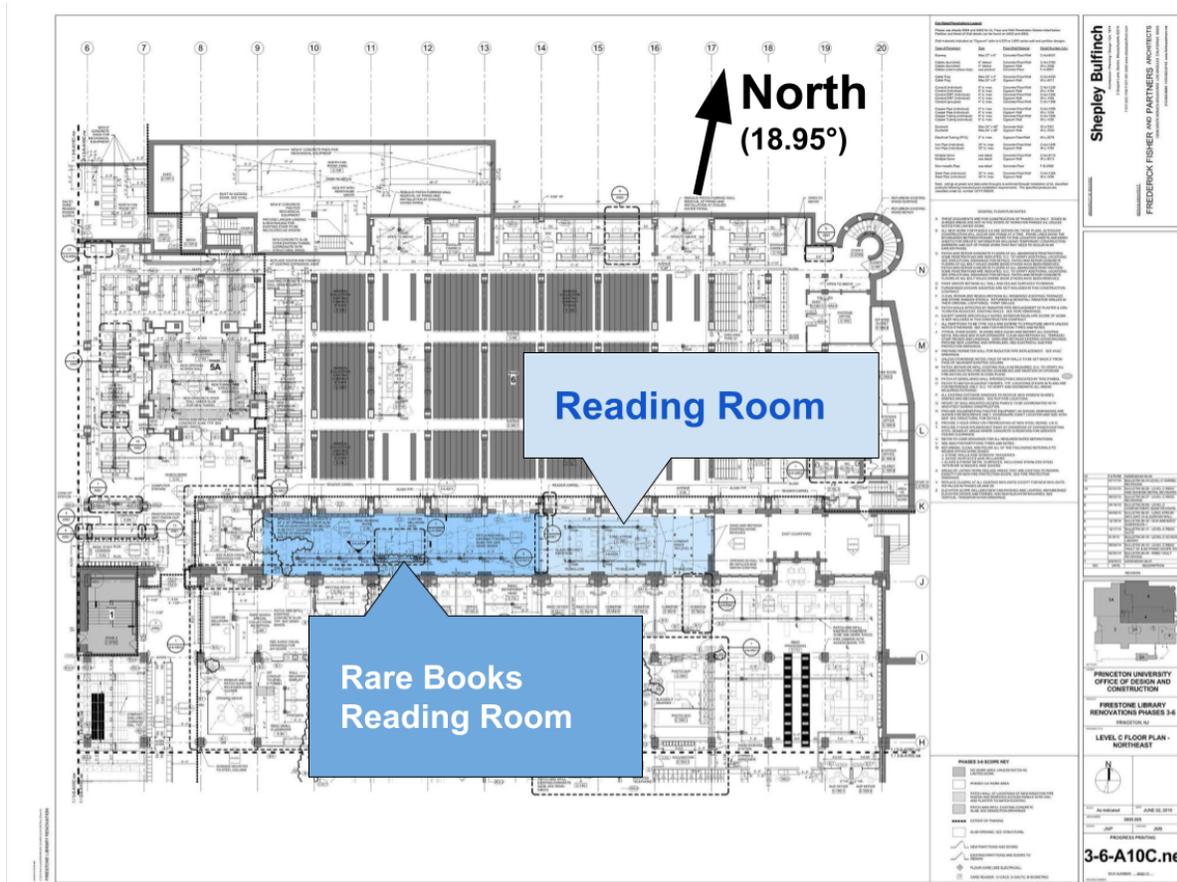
Architectural Plan of the northwest quadrant of the Firestone Library. The dark blue area represents the rare books reading room. The light blue area is a general reading room. Plans courtesy of Shepley Bulfinch, 2016.
